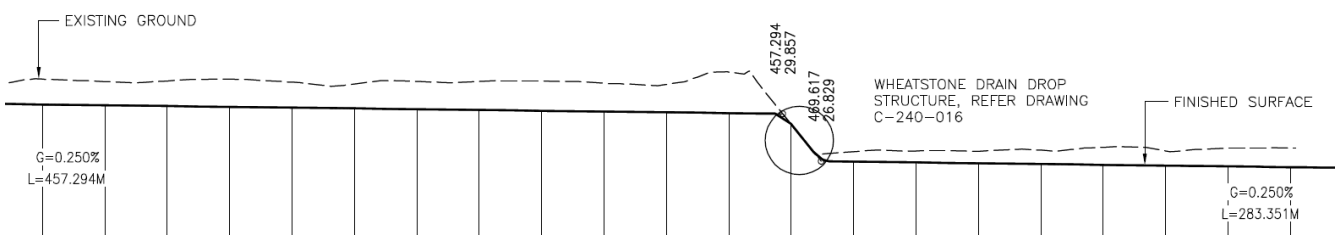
Long-section of the redirected Wheatstone Drain through the river terrace
